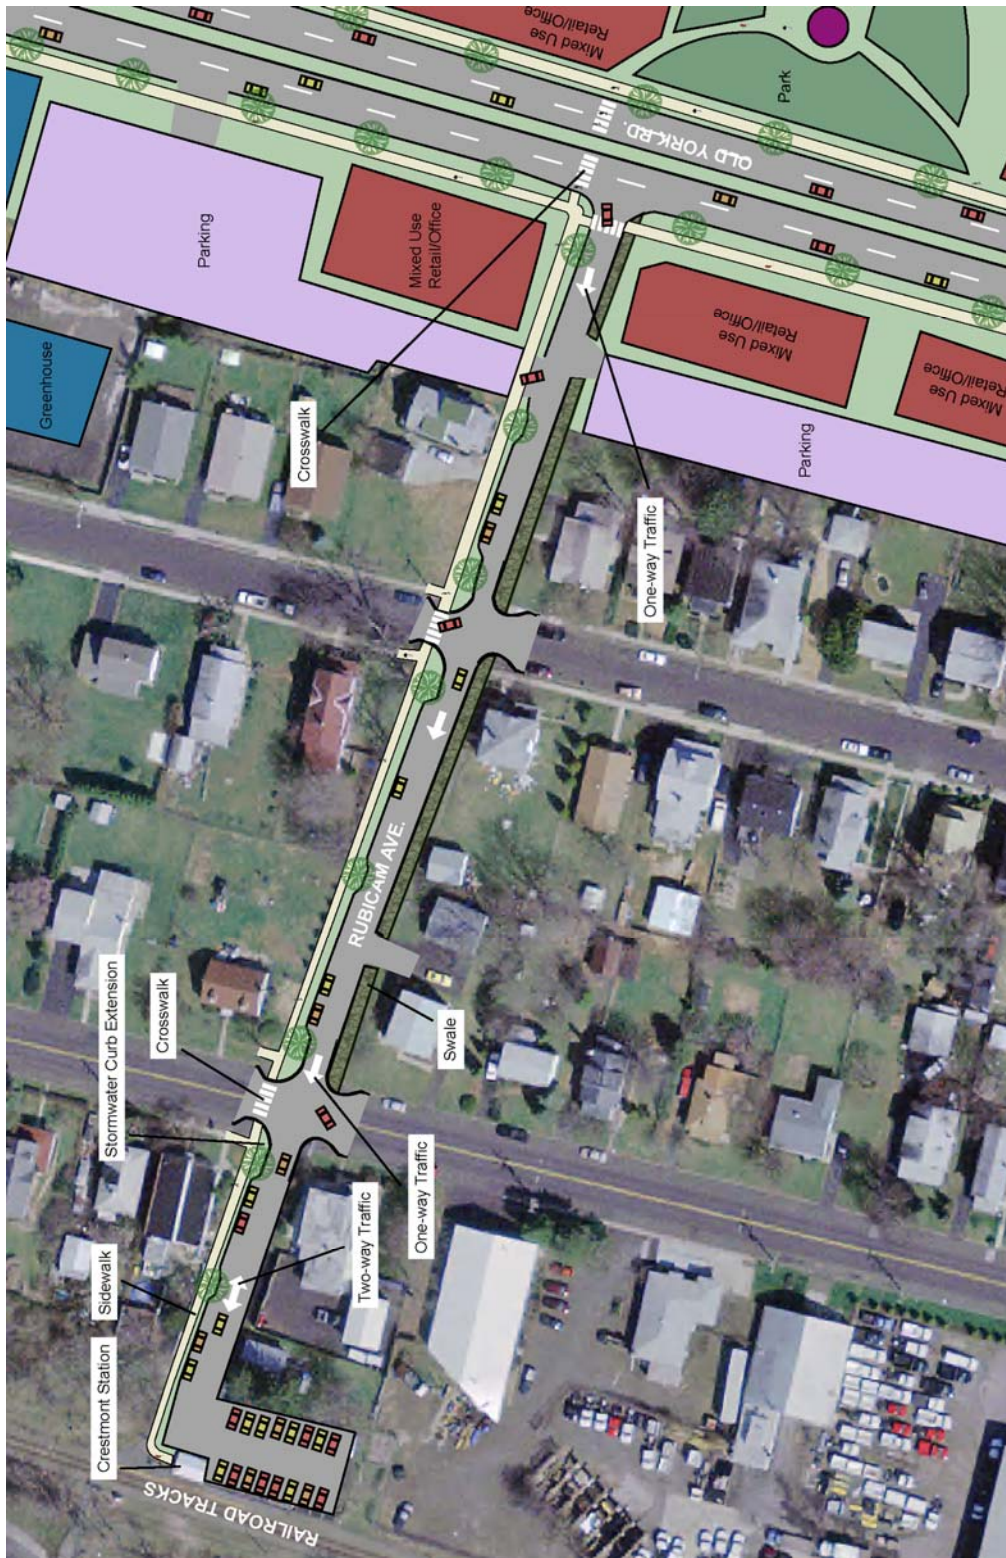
Site Plan Showing Proposed “Green Streets” Elements along Rubicam Avenue in Abington Township. (Note: Land use elements along Old York Road were proposed by the *Draft Old York Road Corridor Improvement Plan, Abington Twp.*) Source: DVRPC and McCormick Taylor
